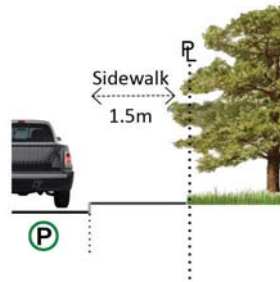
Recommended Neighbourhood Sidewalk Route cross-section
